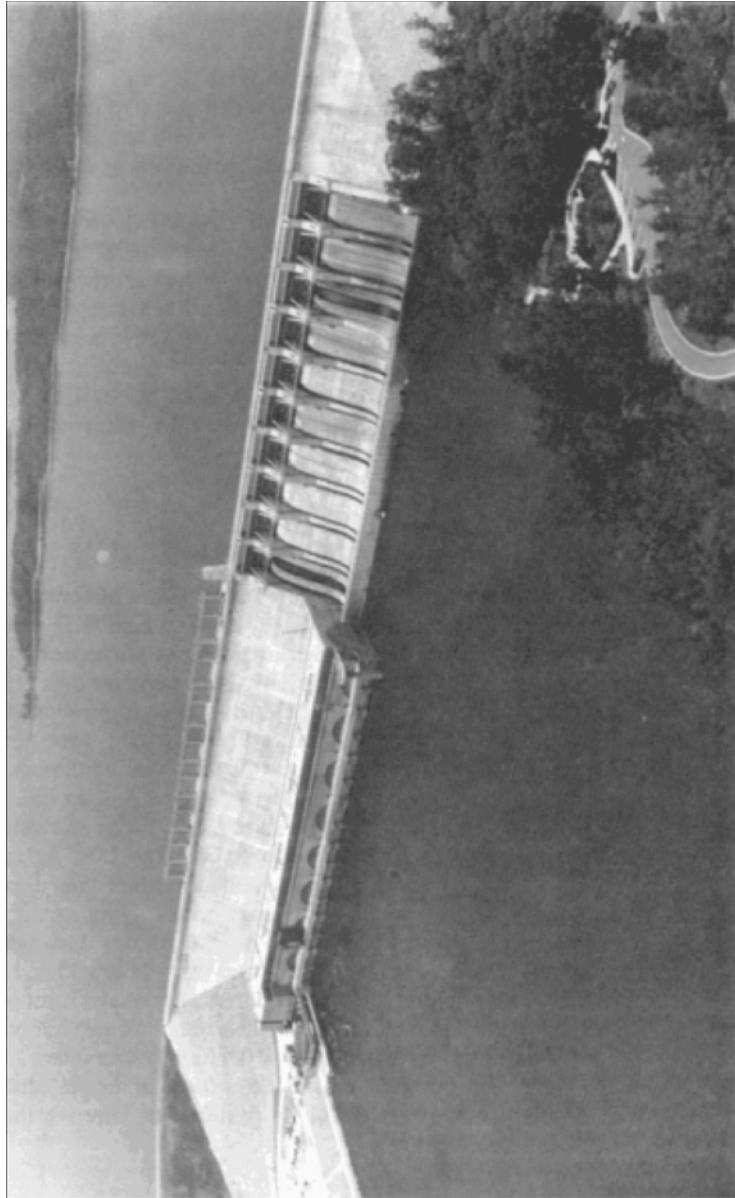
Gravity section of Richard B. Russell Dam, Georgia, built by the U.S. Army Corps of Engineers (4-7).
